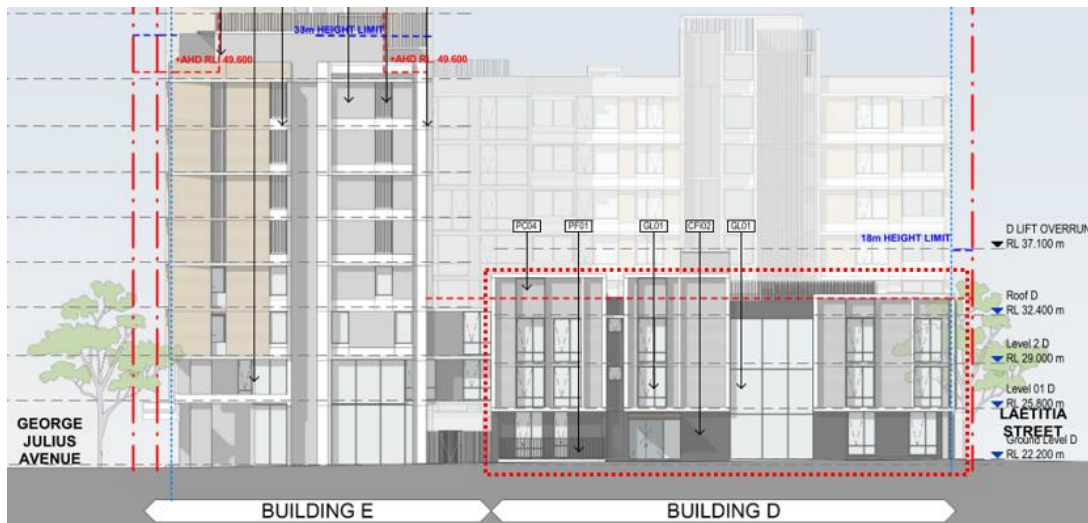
Southern elevation of Building D viewed from the new east-west public park
